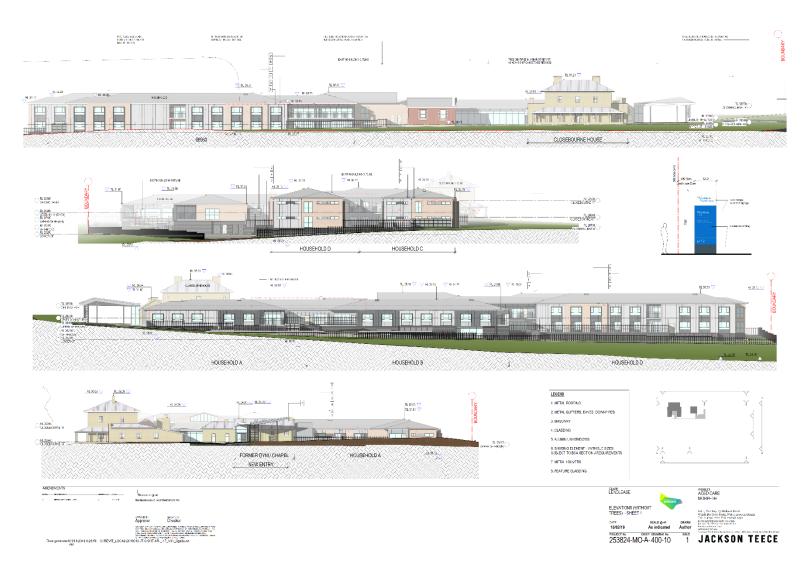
Proposed Elevation Plans – Households A-D Jackson Teece, Drawing No. 400-10 (10/02/2019).
